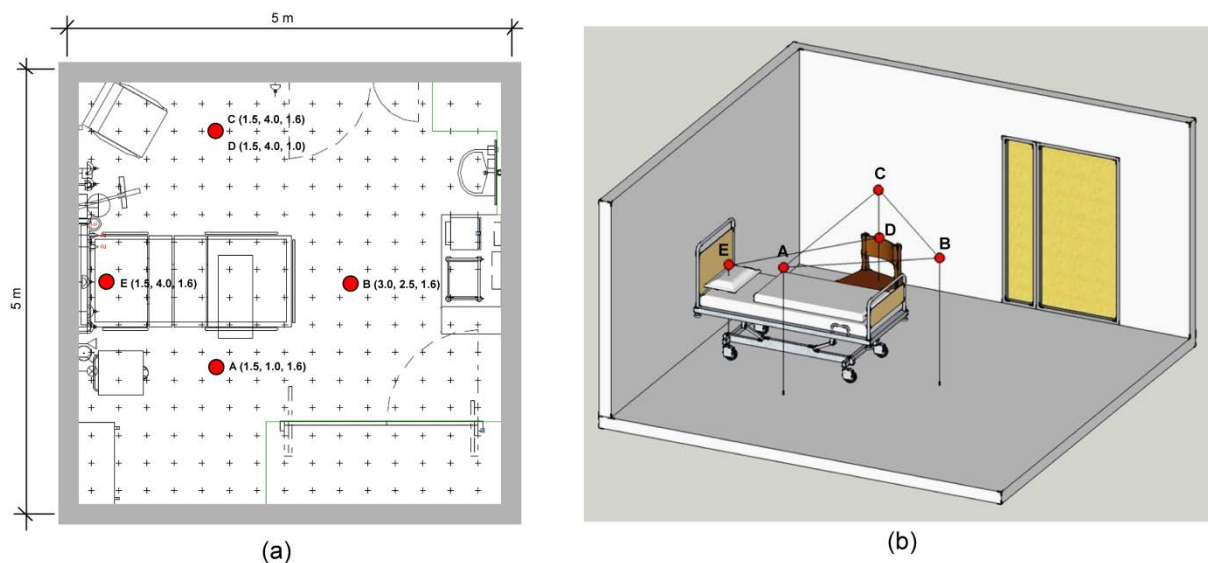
Layout of ADB ward showing POIs in (a) Plan and (b) 3-Dimension
